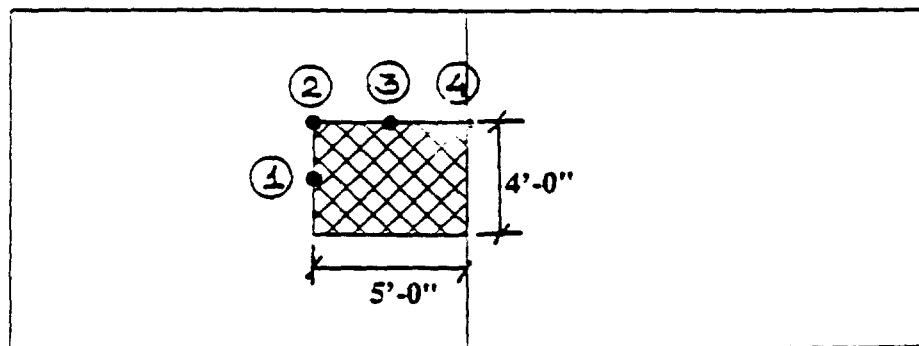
Location and Loading of Edge Cut at Interior Joint
